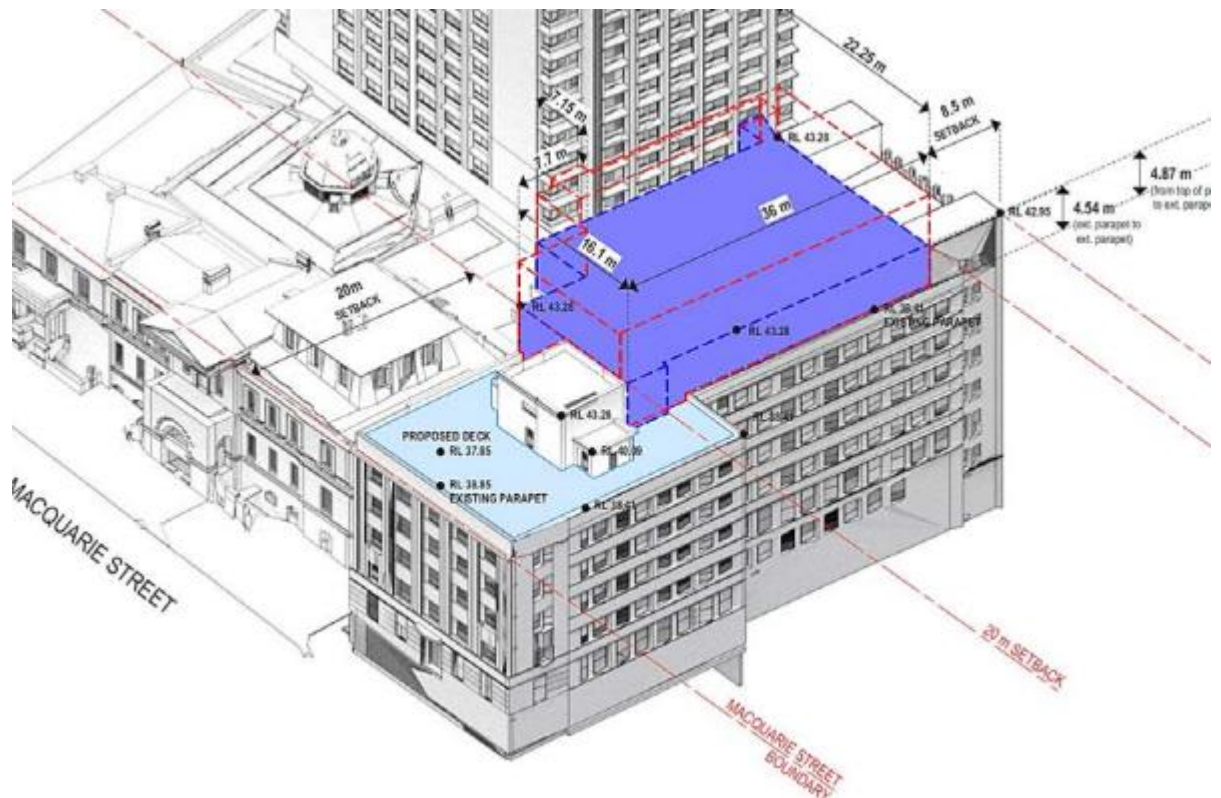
Extract of approved plans of SSD-7693-Mod-2
